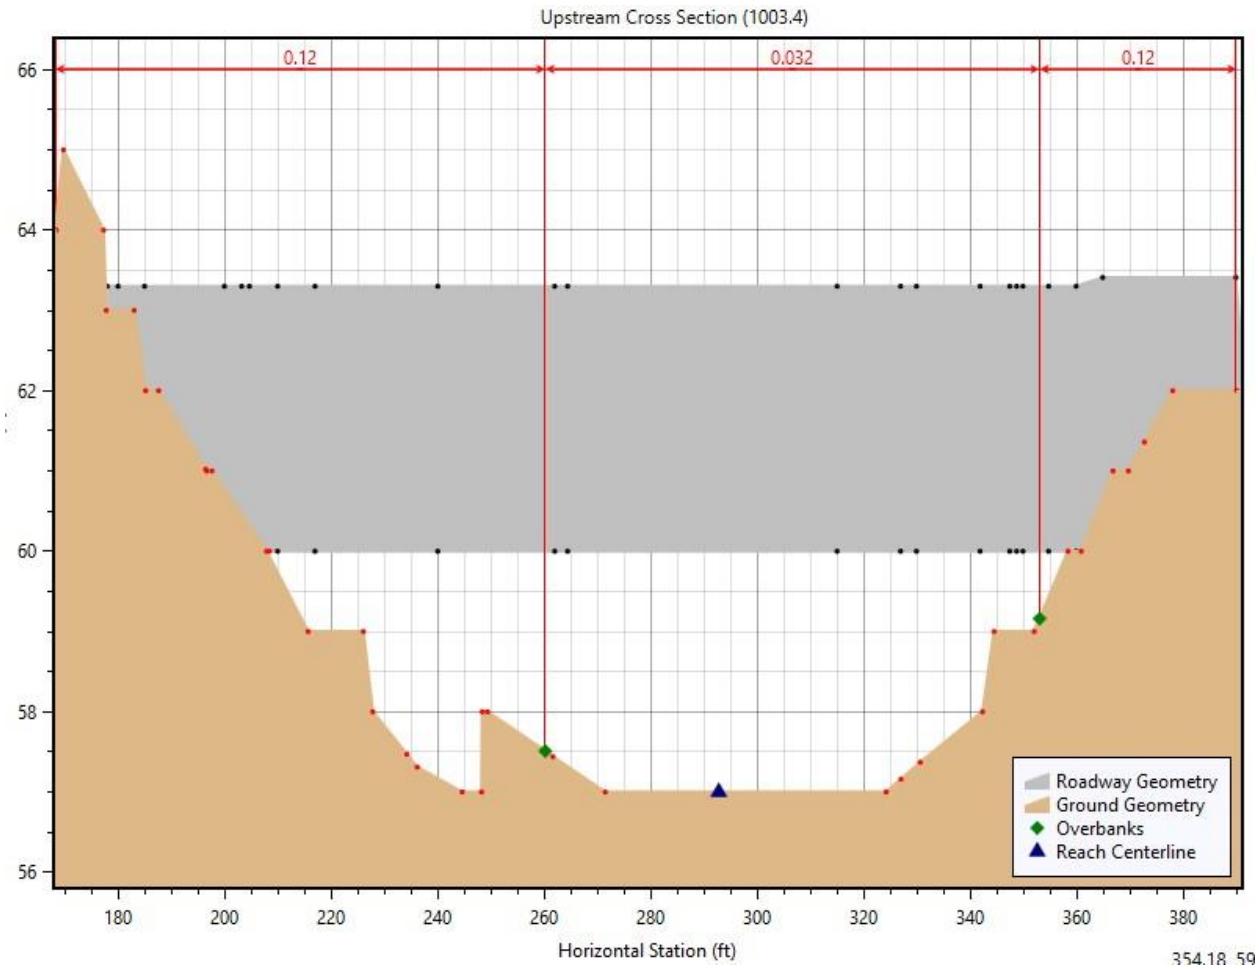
Modeled Cross-Section of the Proposed 150 Ft Span Bridge
